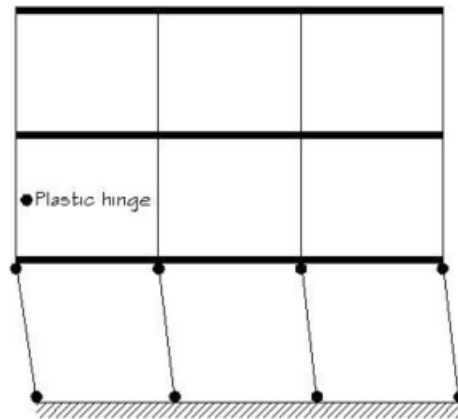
Typical Soft Story Collapse Mechanism[16]
